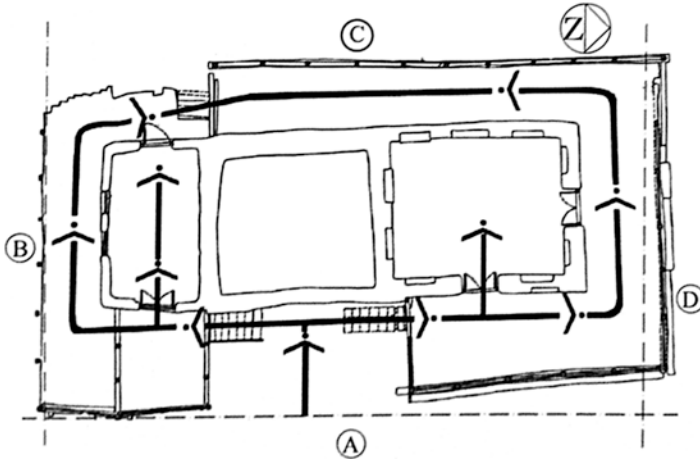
Circulated paths in the plan of Amini house; ground floor (Taleghani 2010c)
